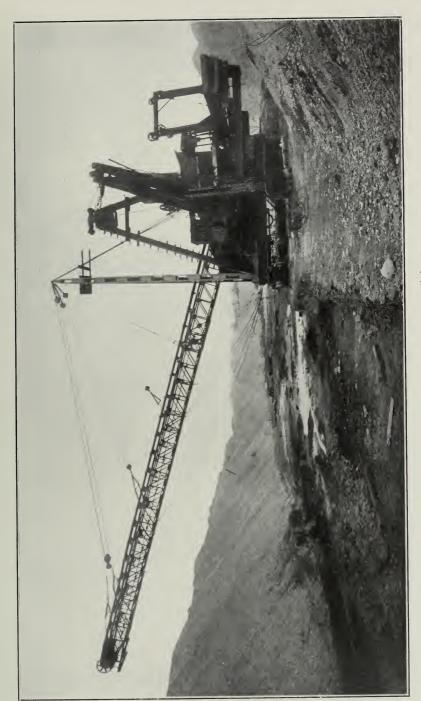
Steam-shovel with belt-conveyor spoil-elevator
